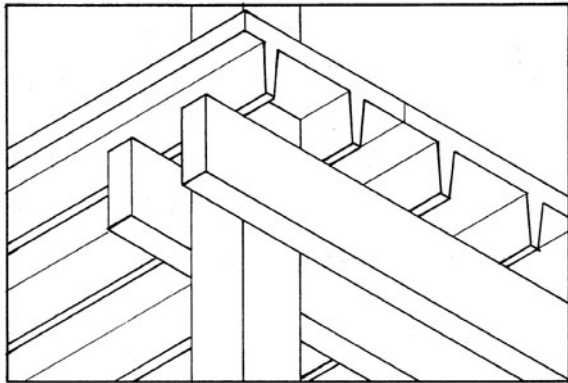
Exposed precast double-T sections and overlapping beams are indicative of precast frames.
